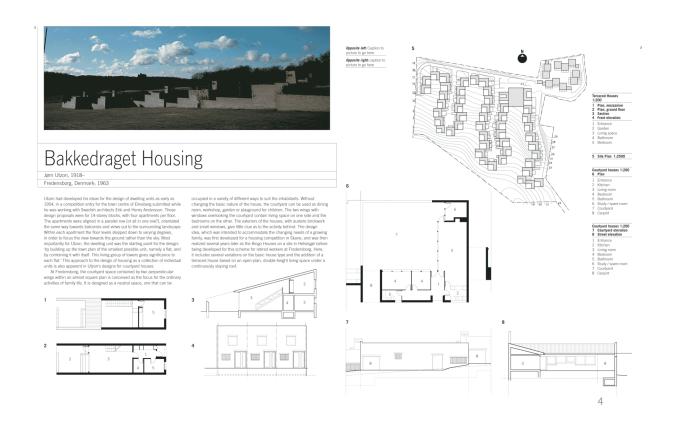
Extract from Key Urban Housing of the Twentieth Century: Plans sections and elevations Laurence King (UK) Norton (USA) 2009. Chapter 4 Alternatives, page 130.
